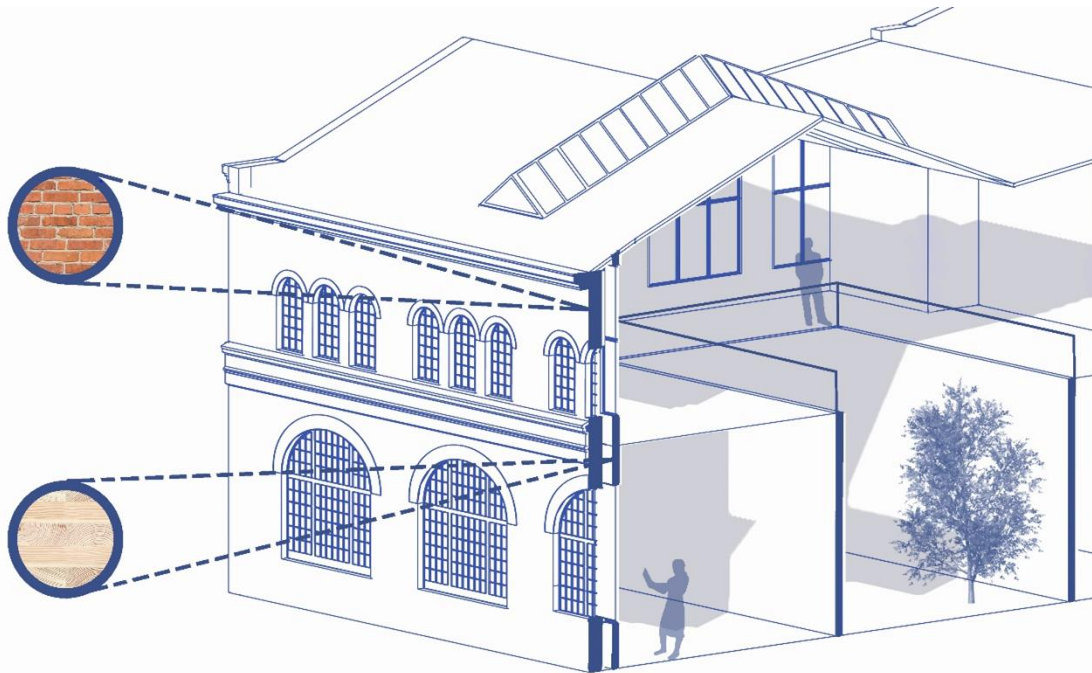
Axonometric visualization of the case study that shows the exterior wall as a shell and the new construction inside
